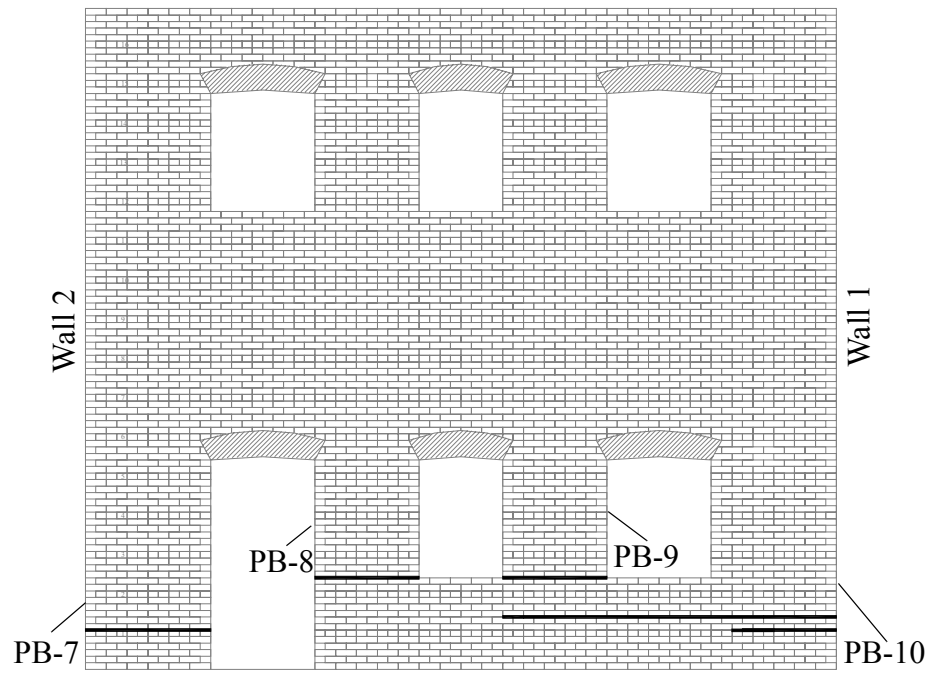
Crack pattern of Wall B following Test Run 10.
